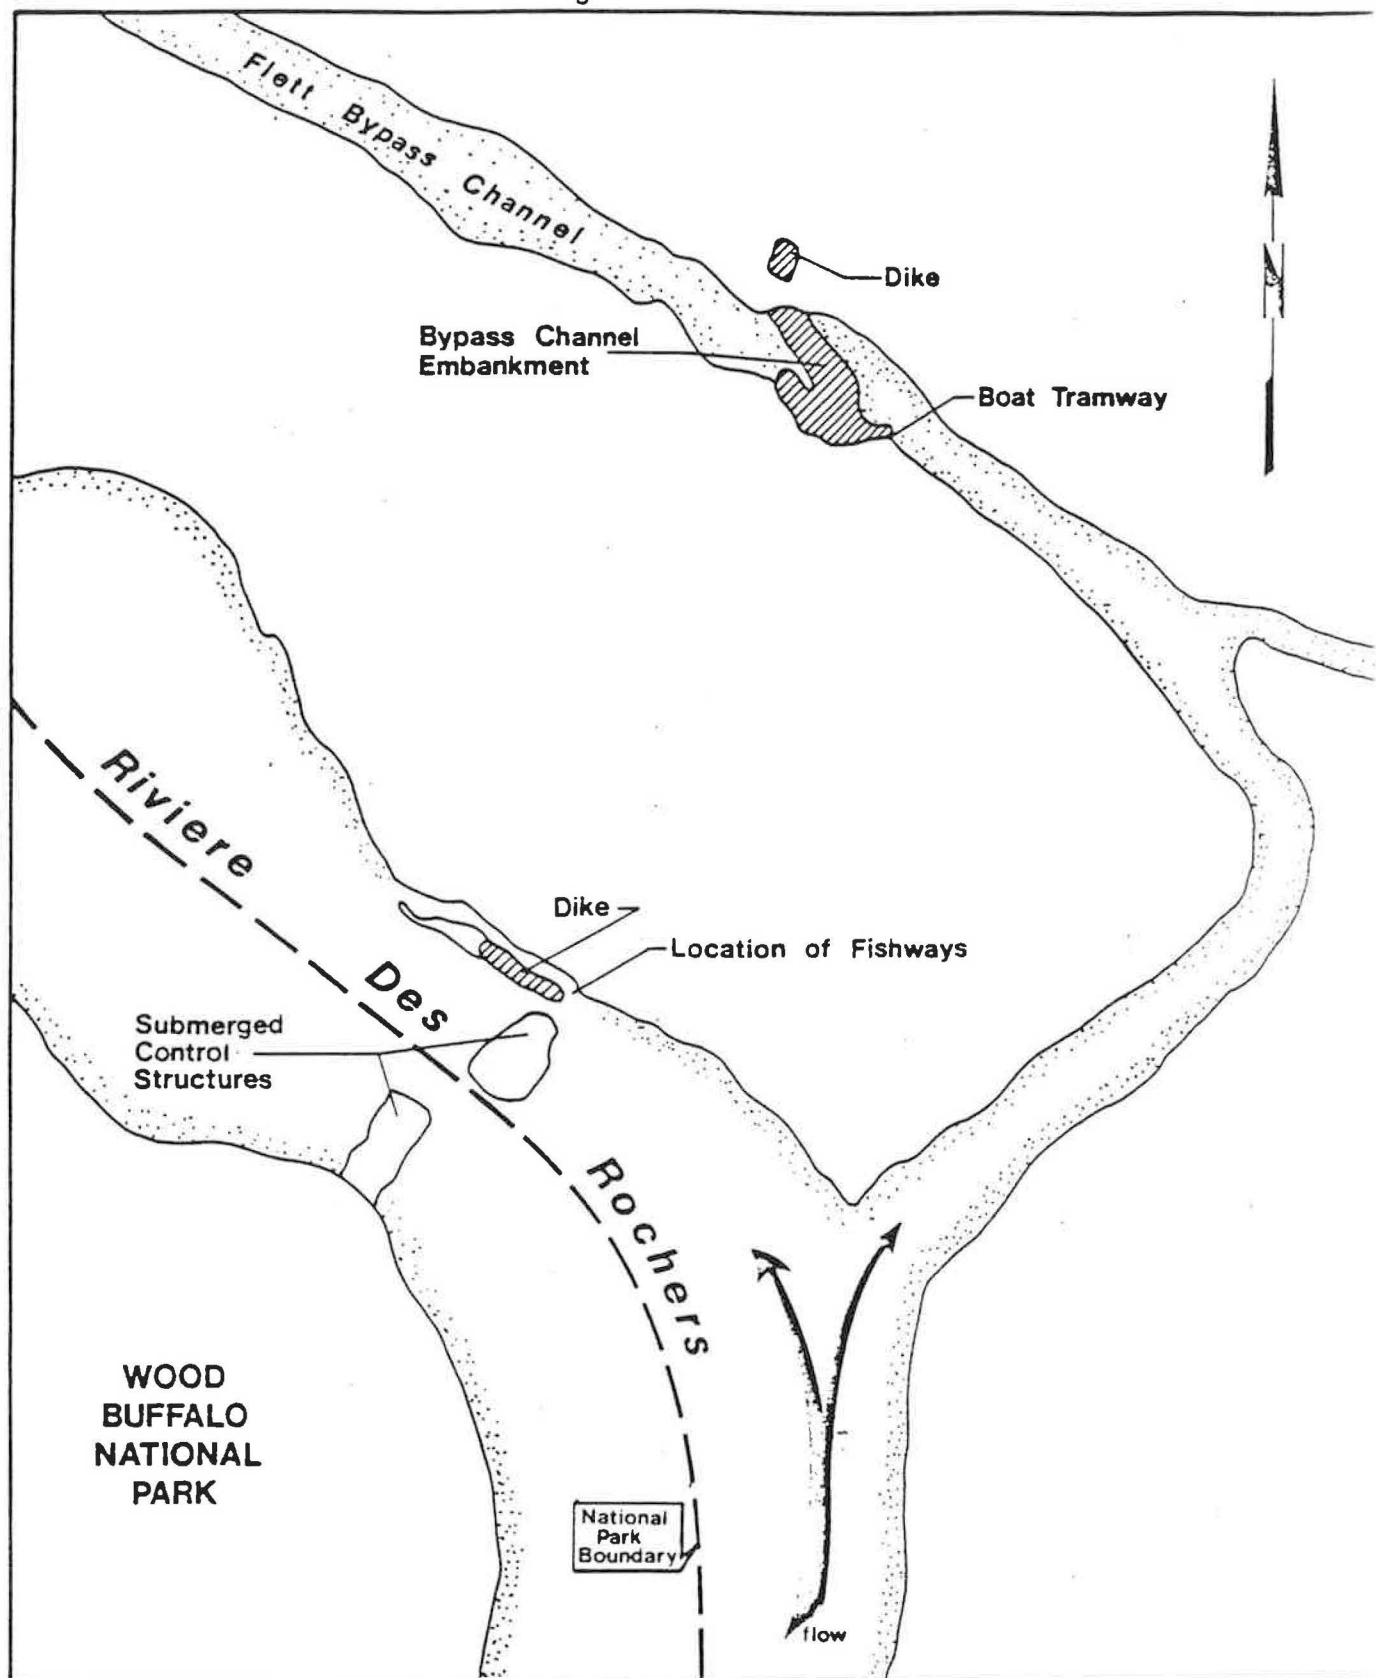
Riviere des Rochers weir test site. Prototype fishways are installed between dike and north bank.
